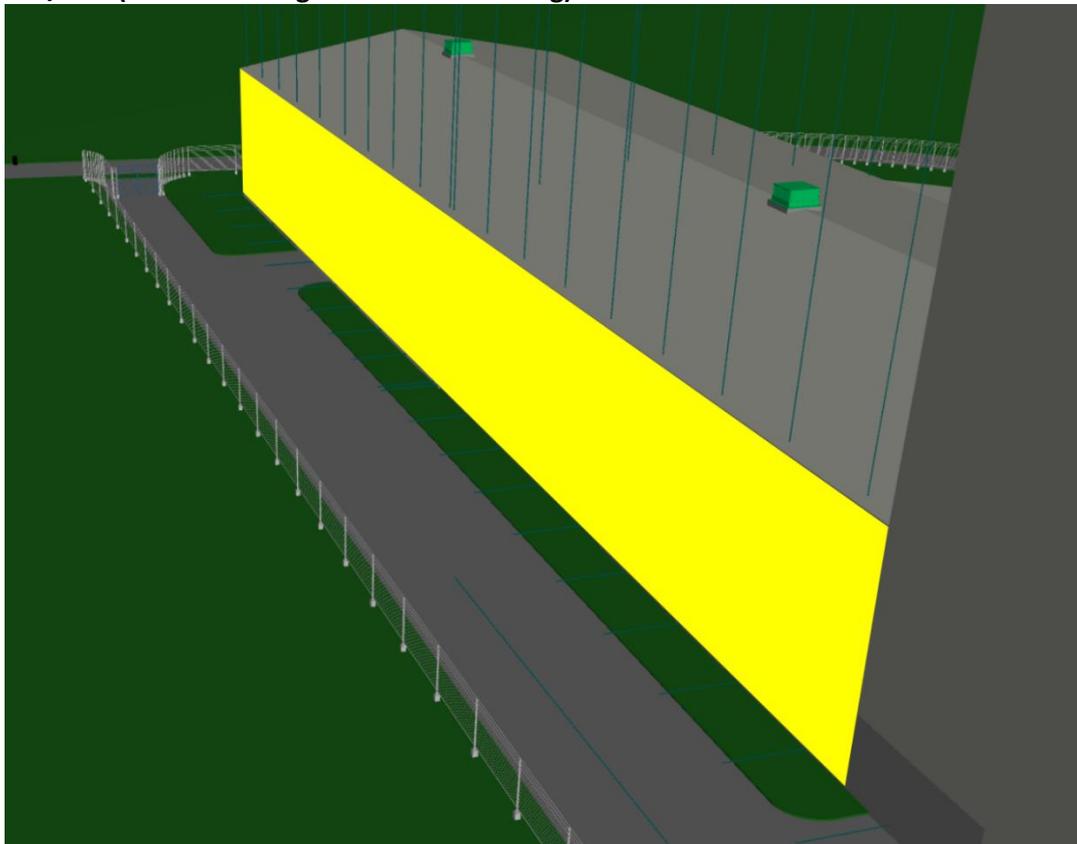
Fuel Handling and Bunker Building (UEA, UEB) South Elevation
